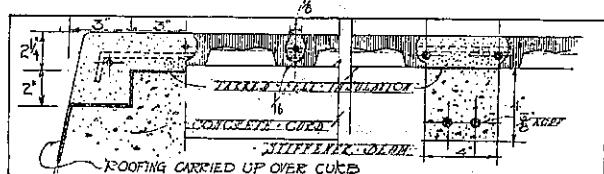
DETAILS OF KEPPLER ROOFLIGHT CONSTRUCTION
